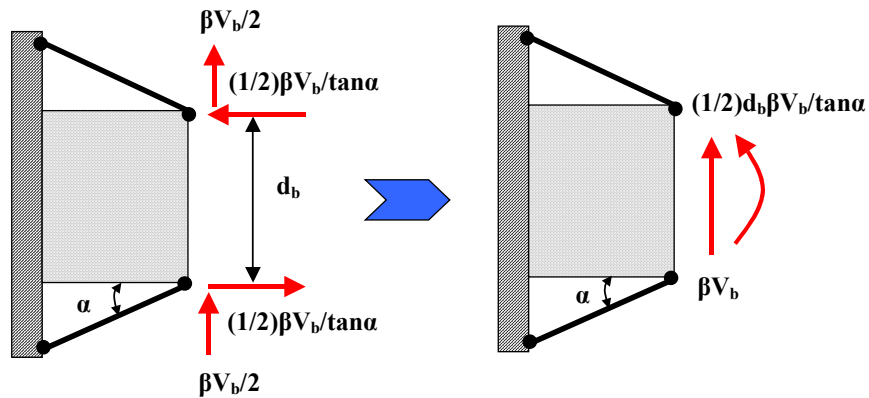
Eccentric force due to haunch strut action on the beam
